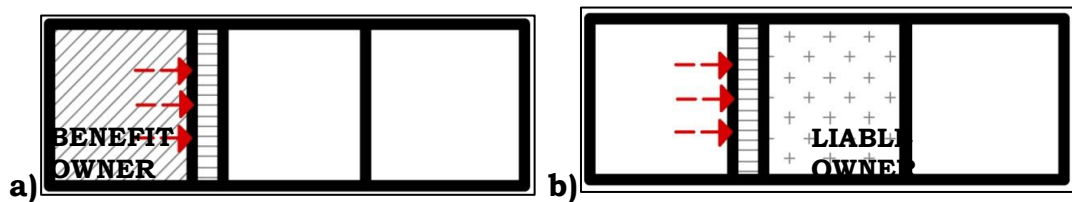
a-b) Resting timber wall benefit on a common wall of an adjacent plot.
